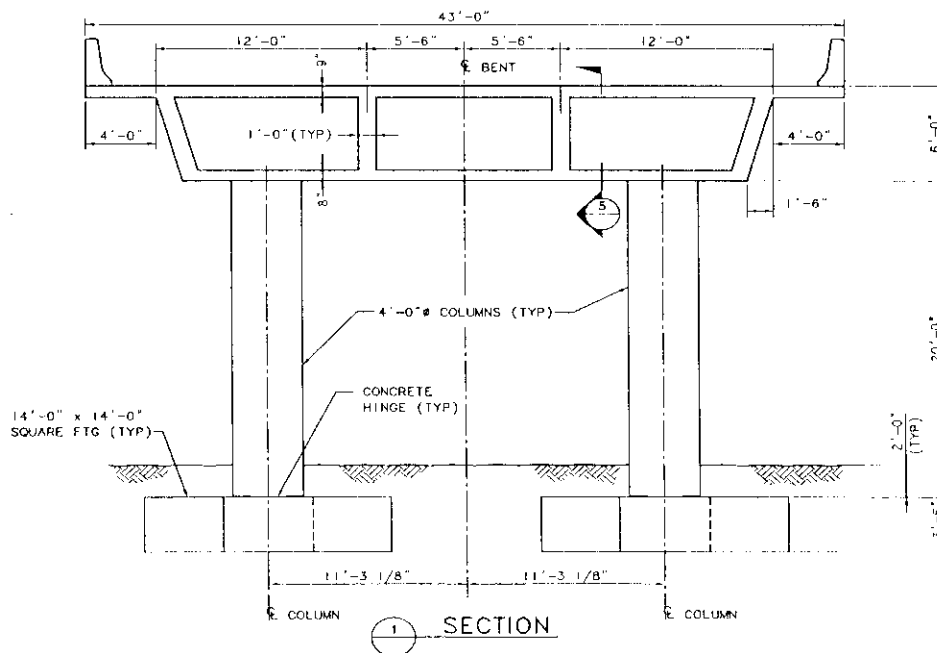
Benchmark Bridge Geometry (FHWA, 1996)
